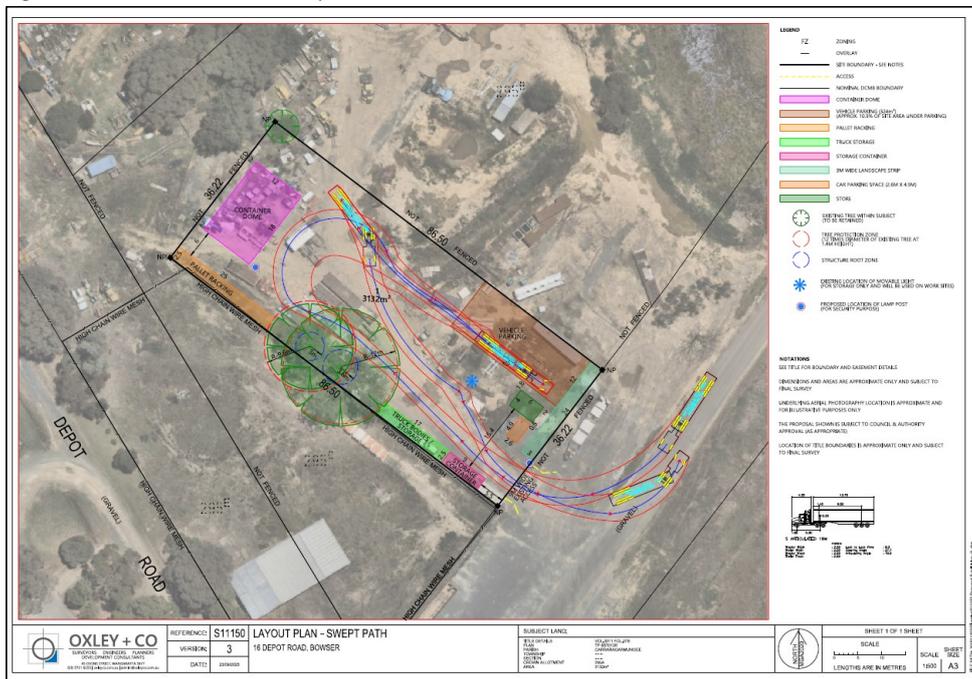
Proposed plan Ref S11150 v3 – Swept Path
